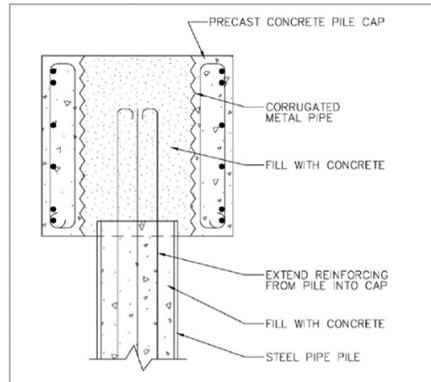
83 Pile Cap Connection using Extended Reinforcing Steel [6].
